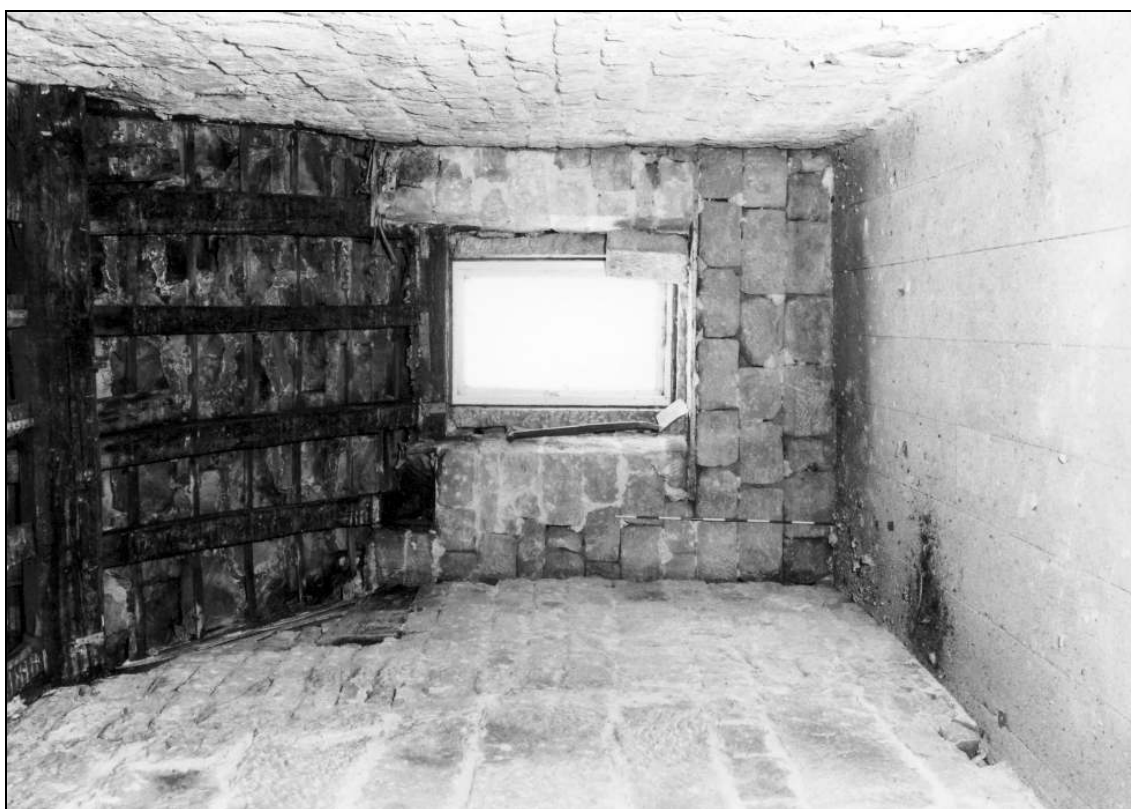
First floor room over hearth passage, from the north (film 4, frame 18)
